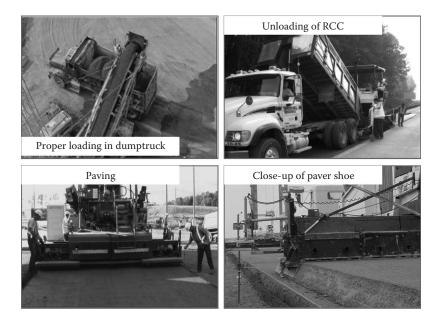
RCC loading, unloading, and paving. (From Poole, B, Roller compacted concrete GDOT applications. In *Roller Compacted Concrete: Design and Construction*, ed. Atlanta, GA, The Southeast Cement Association and PCA, 2008; Adaska, W, RE: RCC Section 7, a personal communication, Hazaree, C, 2009.)
